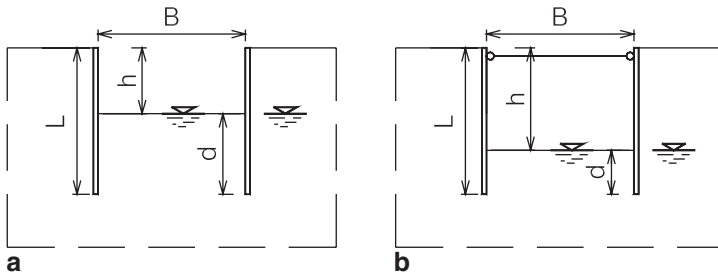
Reference models and geometrical features a tests CWU on cantilevered walls and b tests PWU on propped walls
